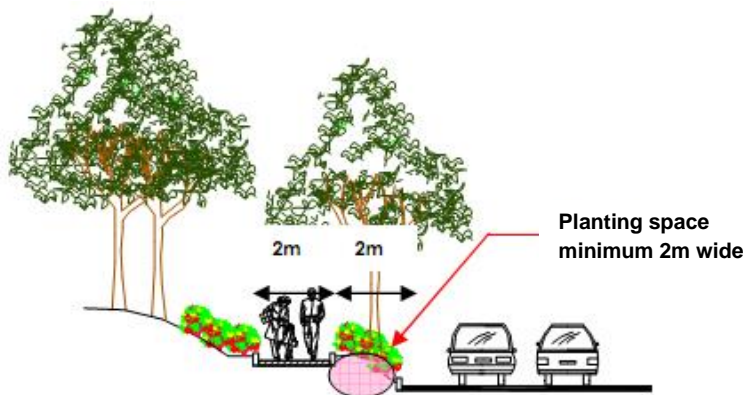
Section on pedestrian walkway divided from main road by using planting area. (Source: Draf Rancangan Tempatan Majlis Perbandaran Ampang Jaya 2020, 2009, p.7)
